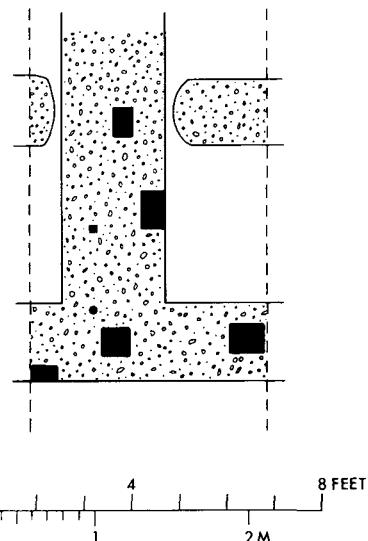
The Hospital, detail of construction-trenches. Scale, 1:48.
